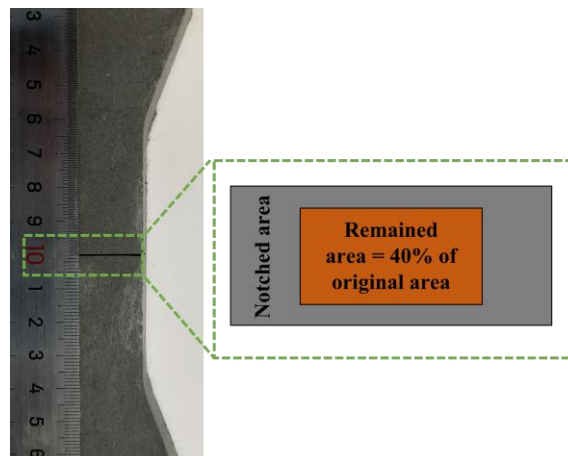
Notched dog-bone shaped specimen for single crack direct tension test.
